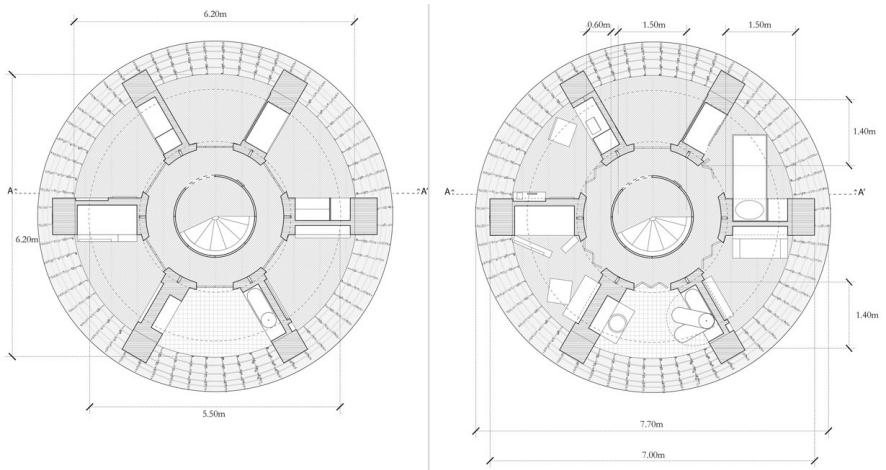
Floor plans in deployed and non-deployed condition of architectural elements
